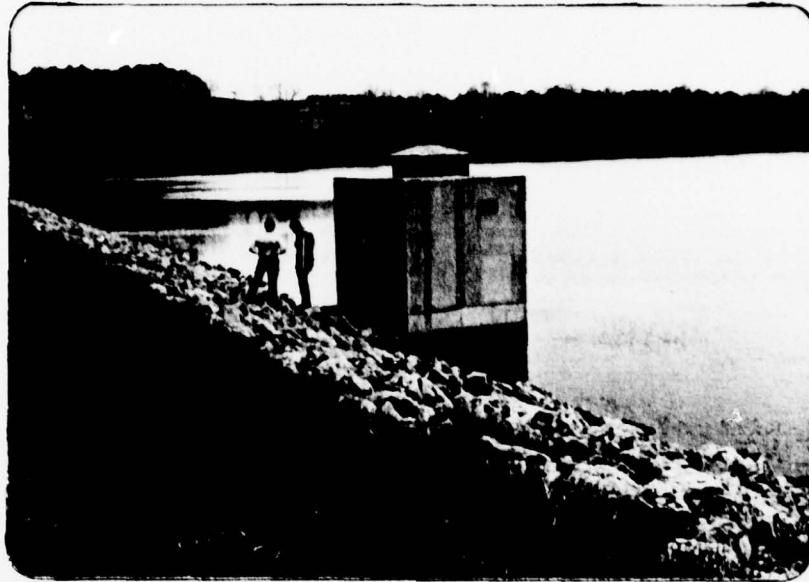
Head Wall for 12 inch A.C.C.M.P. from Stilling Basin
